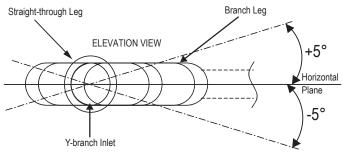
Diagram of an Incorrect Outdoor Unit Y-branch Installation.
